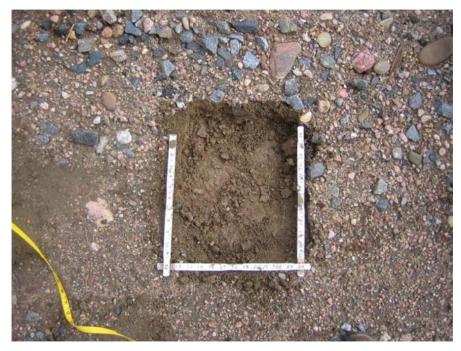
Soil sampling west of I-25 at the approach to Broadway Station.
